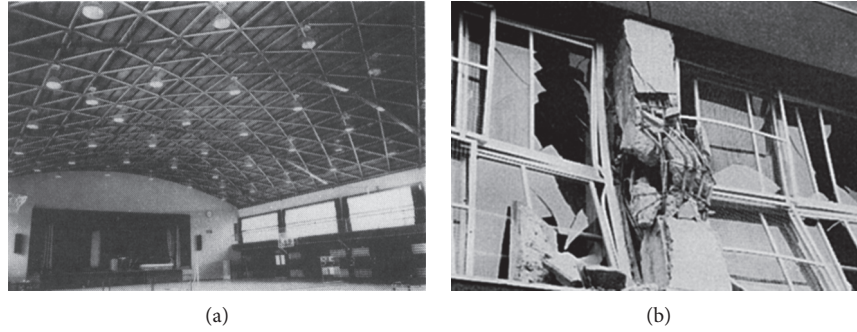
Damage of an RC column of a school gymnasium in Hanshin-Awaji earthquake. (a) Interior view of the high school gym. (b) Damage of a column in the gym.
